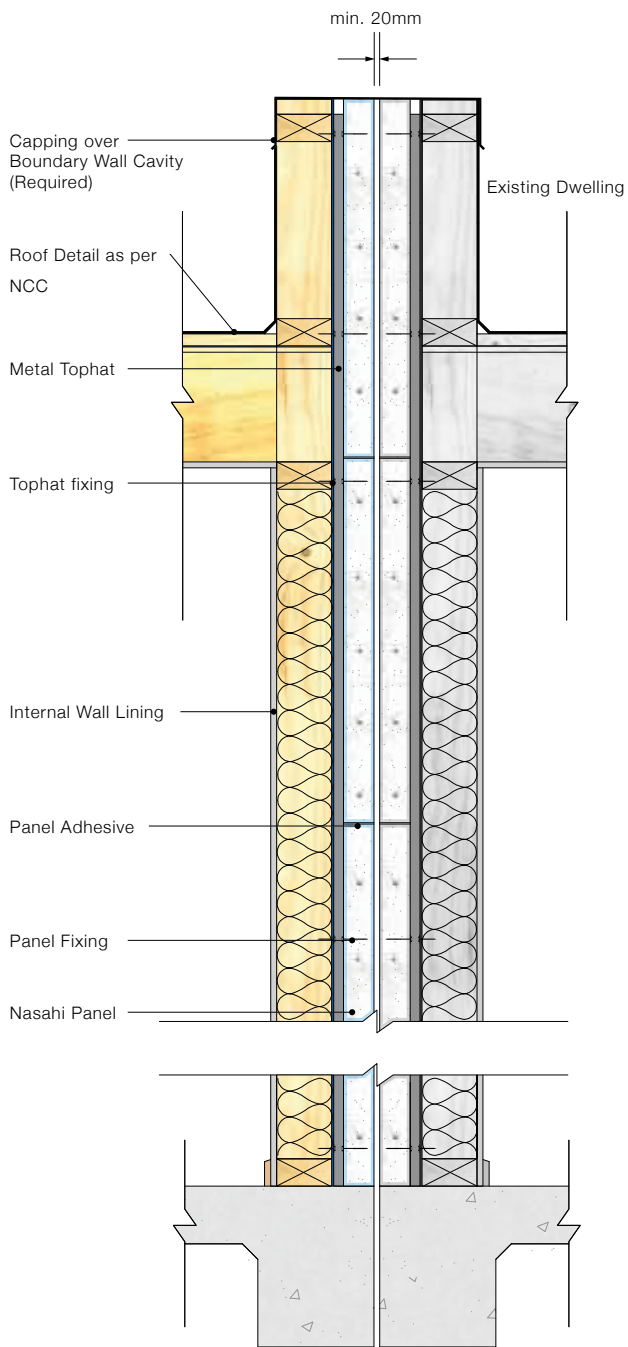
Boundary Wall Detail (Even Slab)
